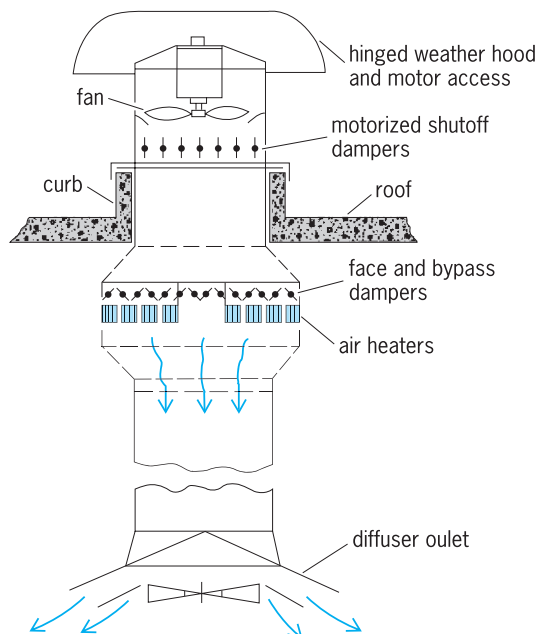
Mechanically powered roof air supply unit. For summer ventilation, the portion shown in solid lines is used. Heater and dampers are for winter use. Diffuser outlet improves air distribution into ventilated space.
